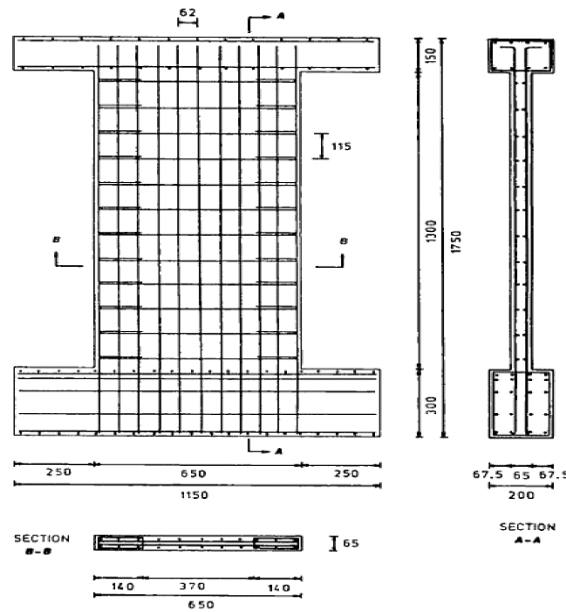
Details of the geometry and reinforcement of the Lefas wall (mm) [9]
